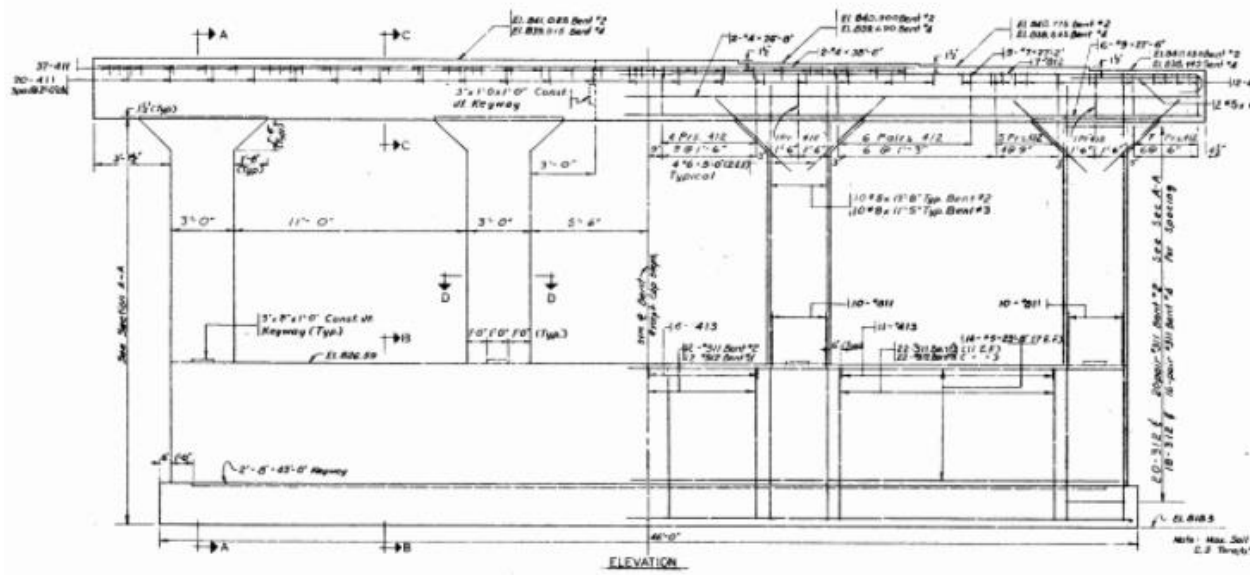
Transverse Elevation of Interior Pier (NBI 40300) (1960)
